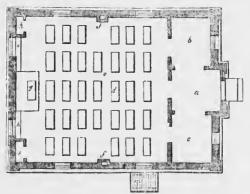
,-Ground Plan, adapted to Figs. 58, 60 and 77.
